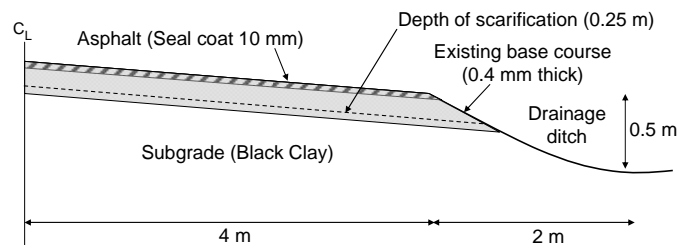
Original pavement cross-section at FM 2 with scarification plan
